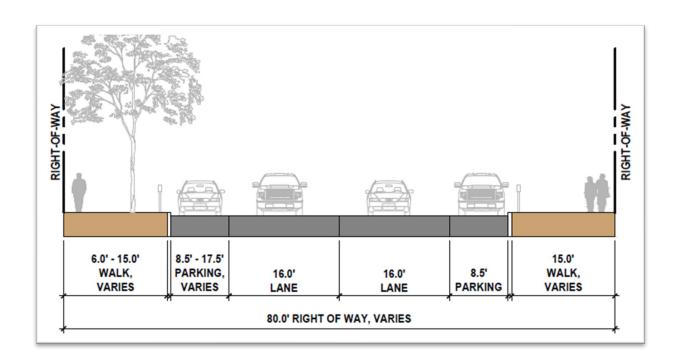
4th St - Existing Cross-Sections Between Rood Ave & White Ave
